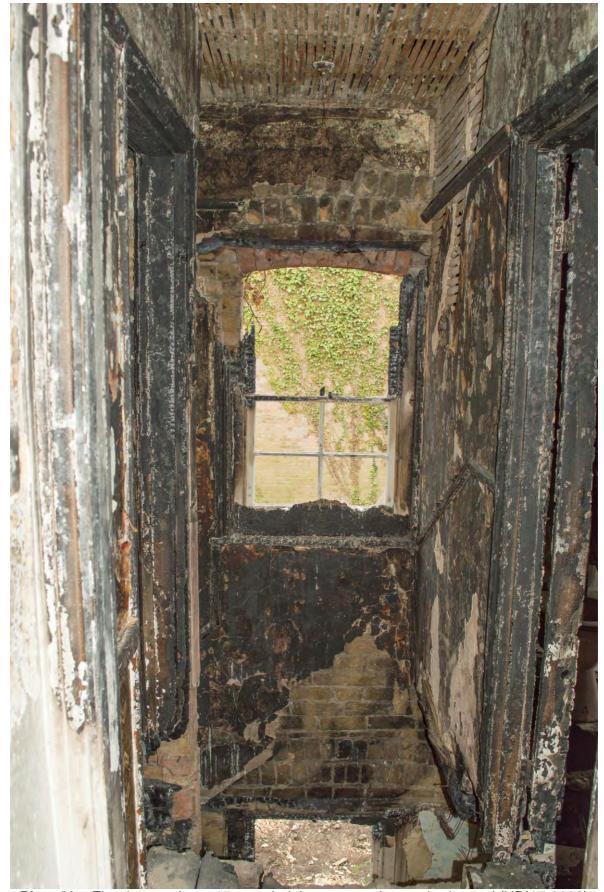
Fire damage in no.15 revealed the construction methods used (HRI17-0080)
